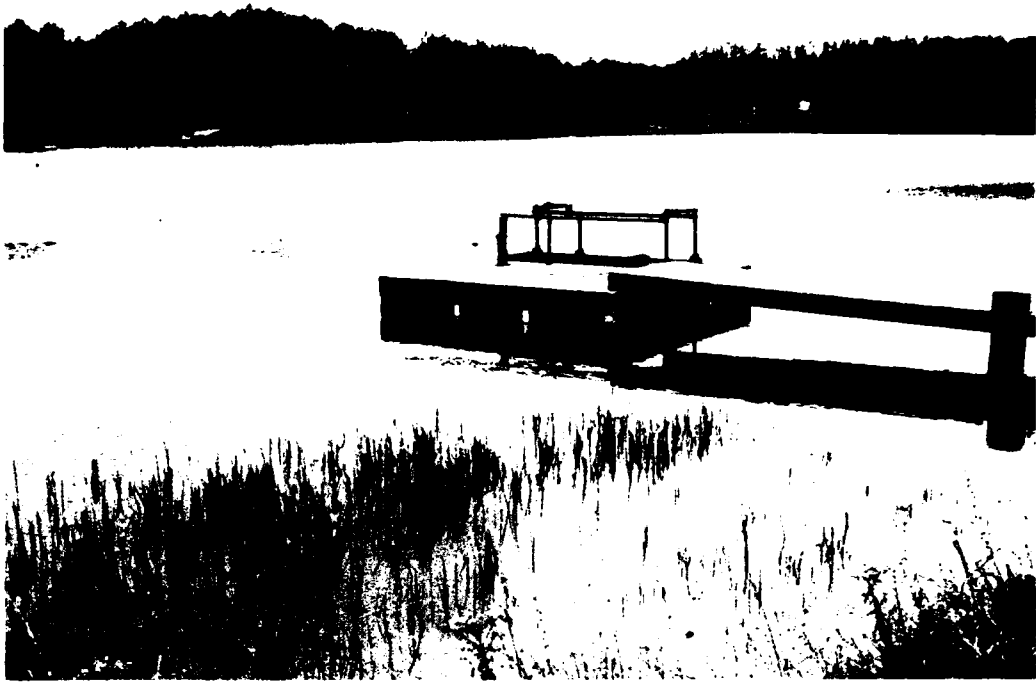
Principal Spillway Riser with Lift Pedestal for Reservoir Drain
